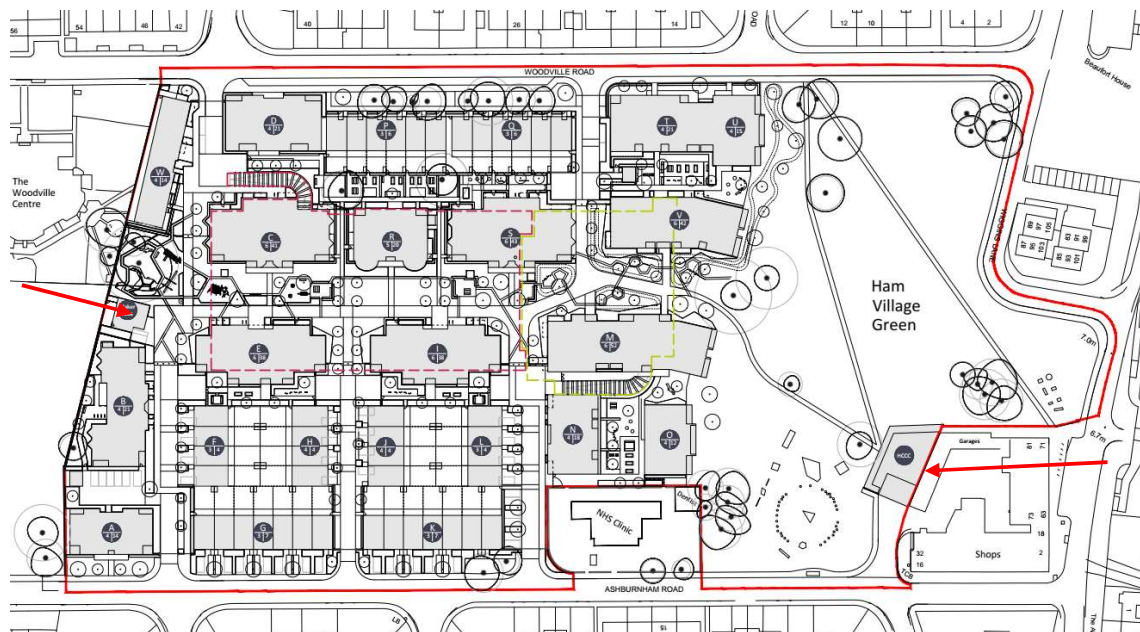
Proposed Master Plan (Source BPTW Planning Issue Masterplan)
